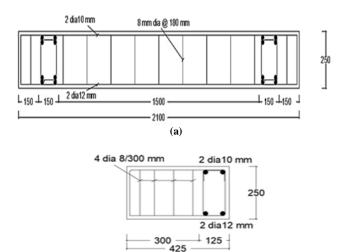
Cross-sectional area and transverse reinforcement details for (a) Beam, and (b) Cantilever.
